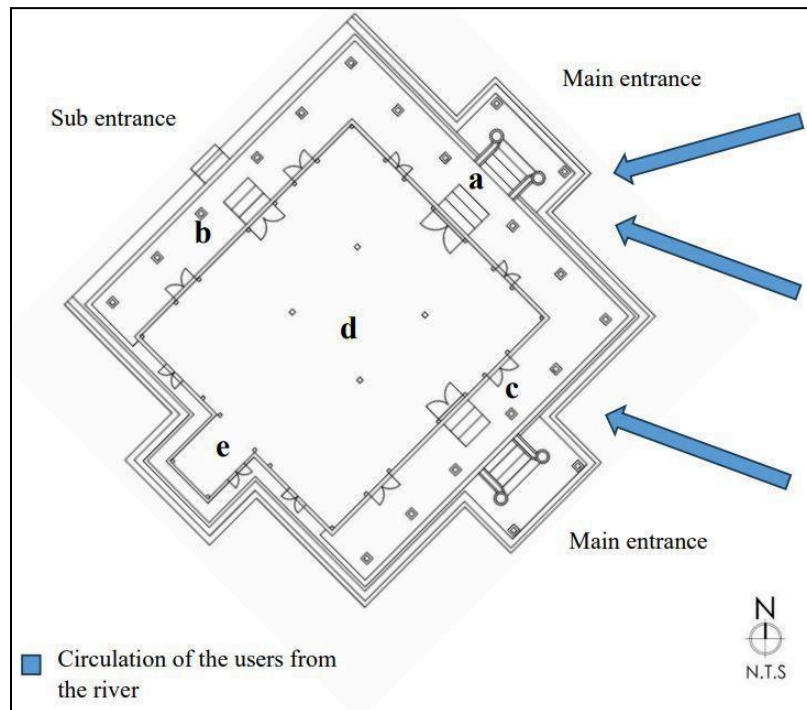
The original floor plan of Masjid Lama Tanjung Beringin
